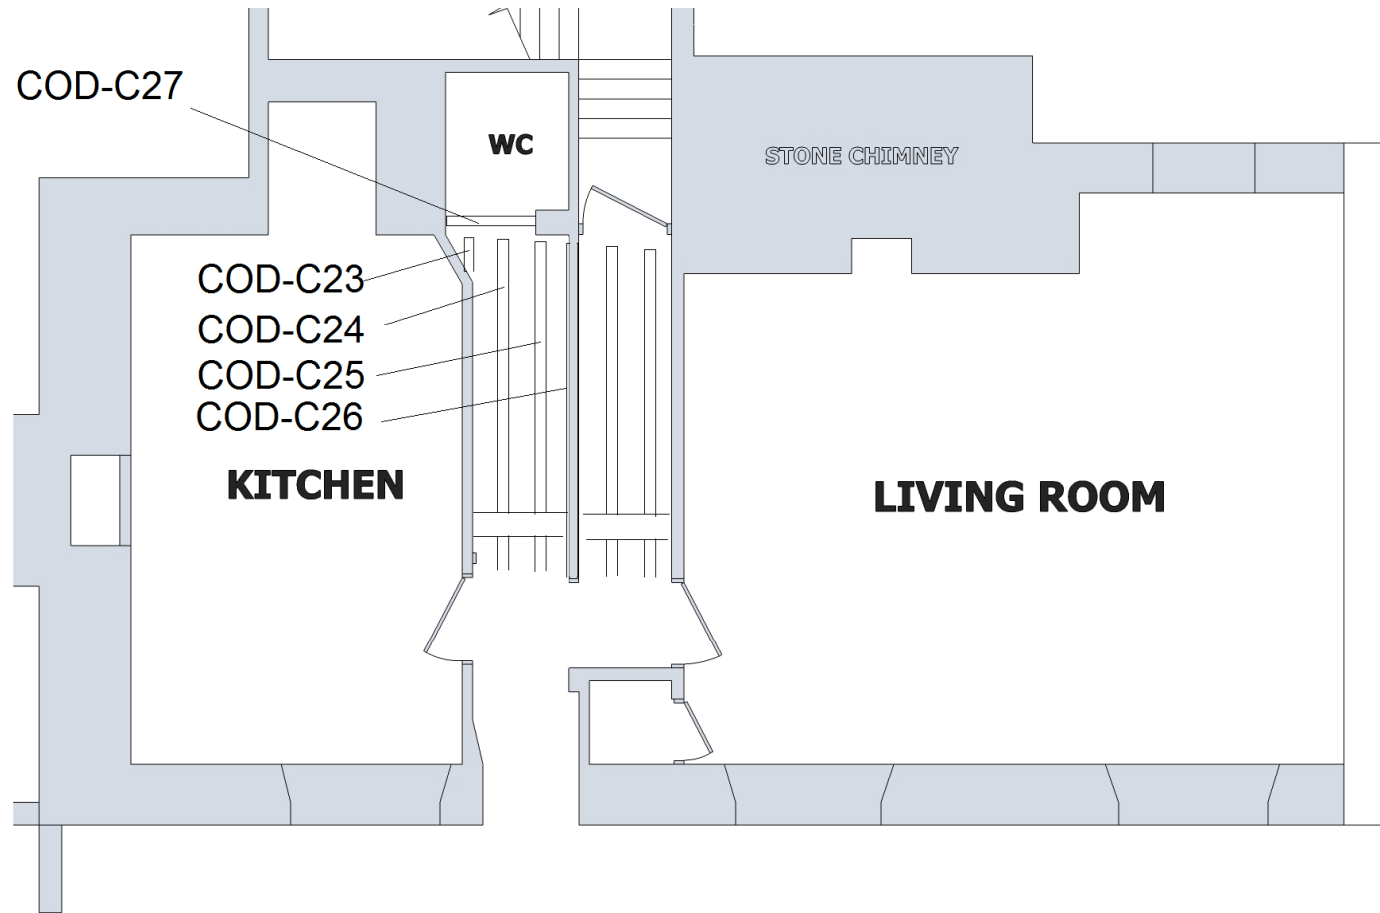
Ground-floor plan of the farmhouse, showing the location of samples COD-C23–7 (after Charles Glenn)
